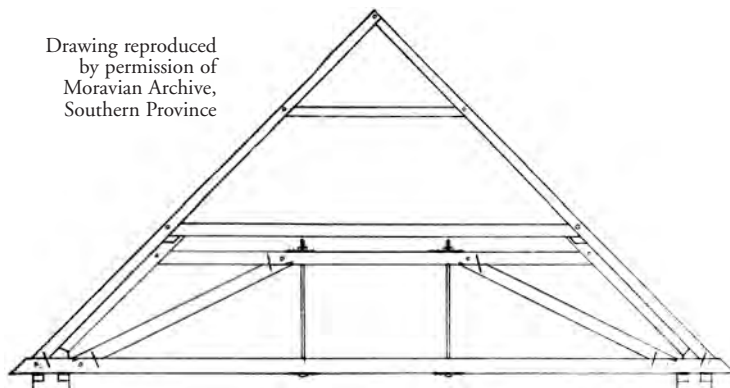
Marshall's design for roof framing at Home Church (1800). Long, fairly light common rafters combine with two collars to form closely spaced light frames, while periodically a heavy truss is built into a frame to carry the ceiling load on iron rods. Clapsed purlins (drawn on end as lozenges) would help carry intermediate roof frames.
